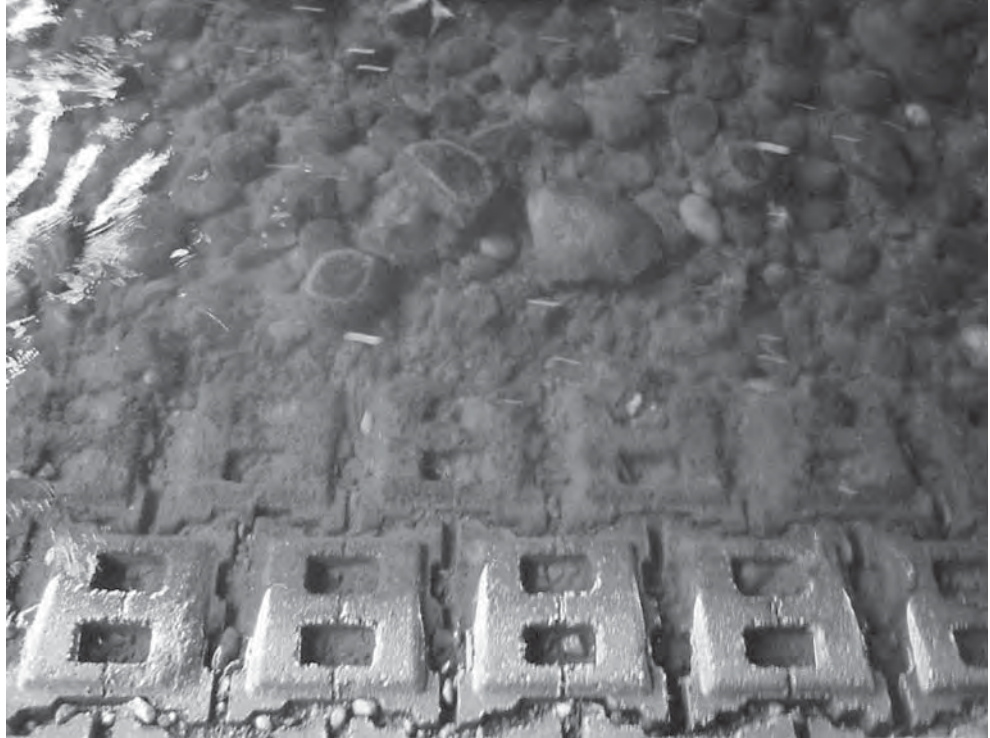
View beneath bridge deck of Mulberry Street ACB installation in September 2005.
